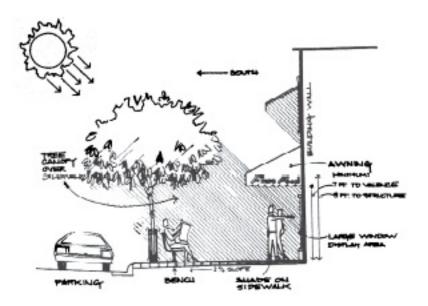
SAMPLE STREETSCAPE SECTION ACROSS SIDEWALK. Note that a window-shopping space is created under the awning, out of the traffic way along the sidewalk. A sitting space is also created under the tree.
